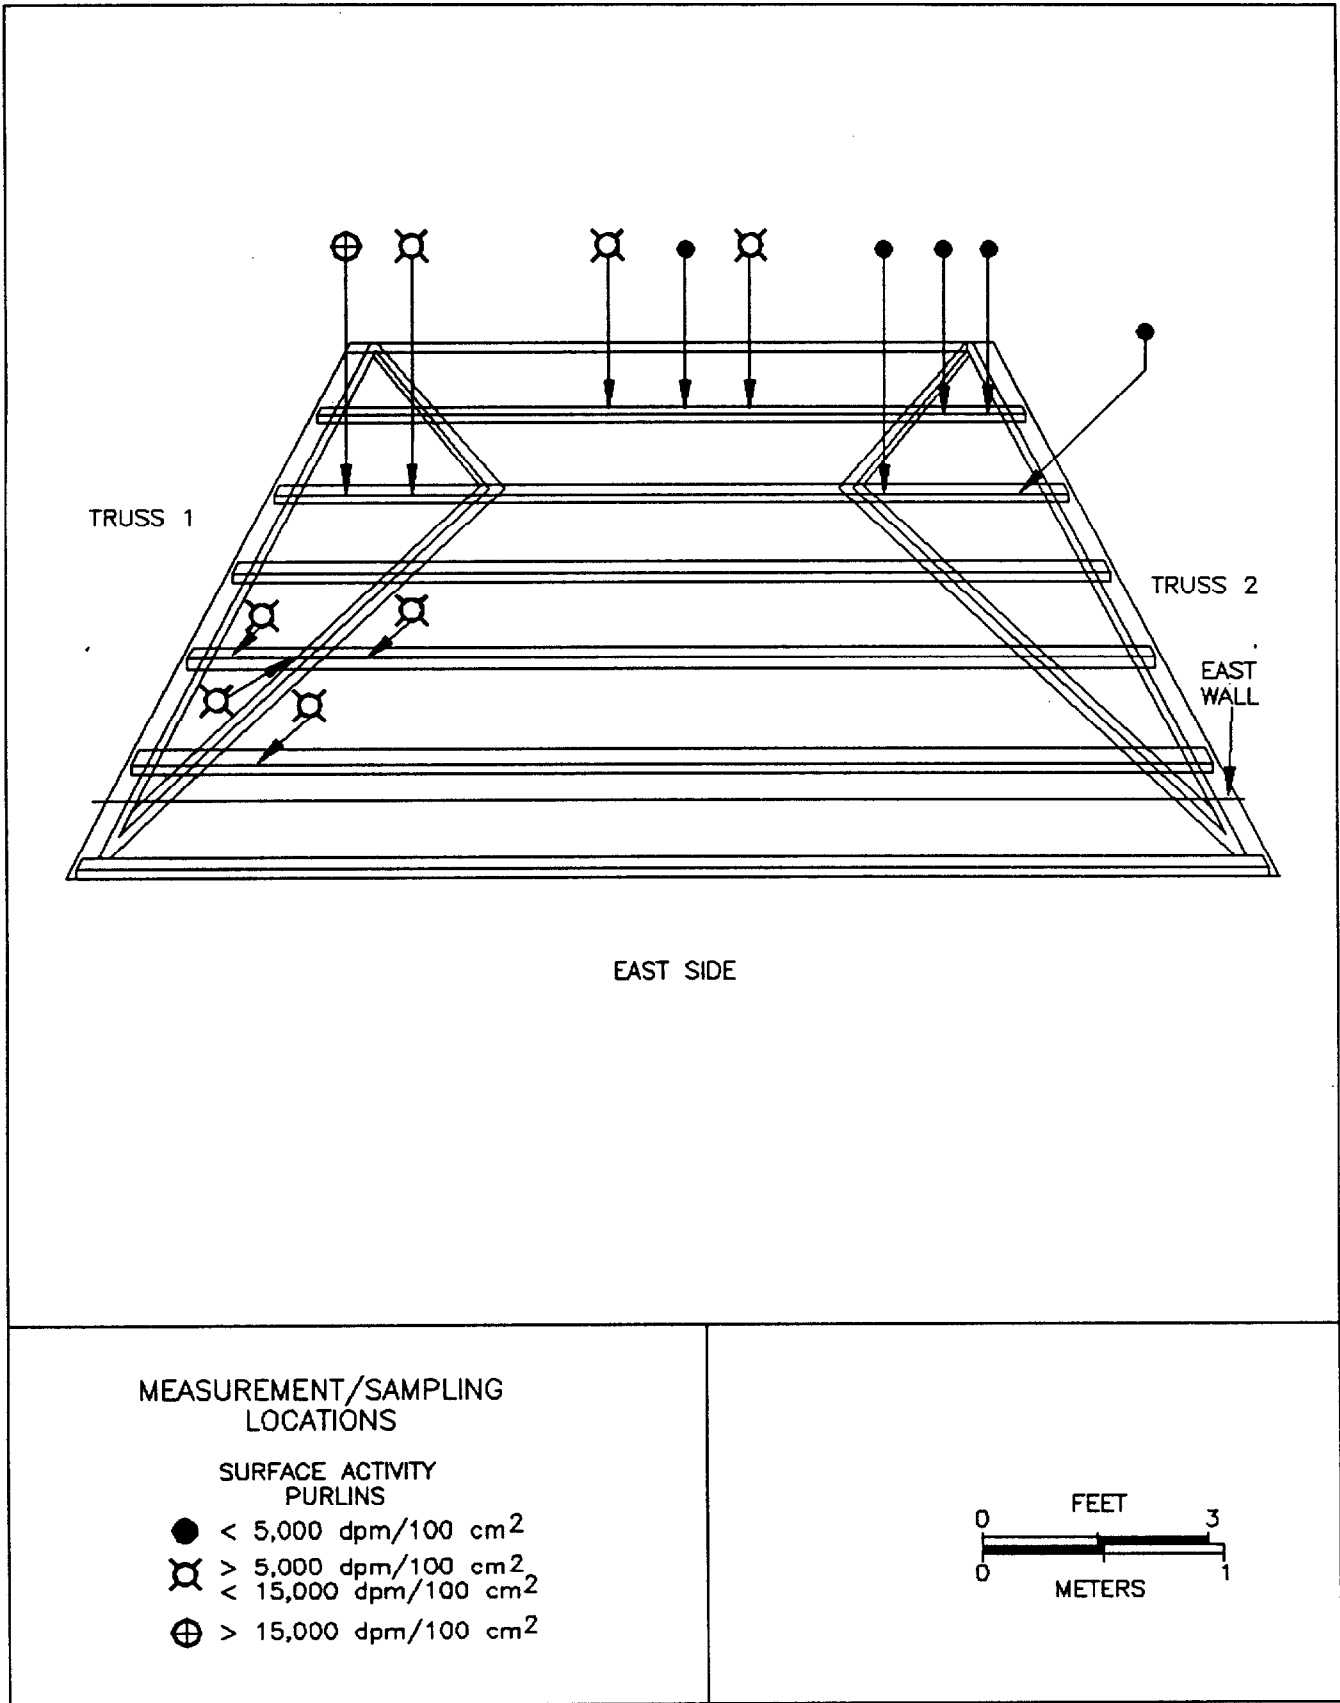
Building 8, Bay 1, East – Measurement and Sampling Locations
